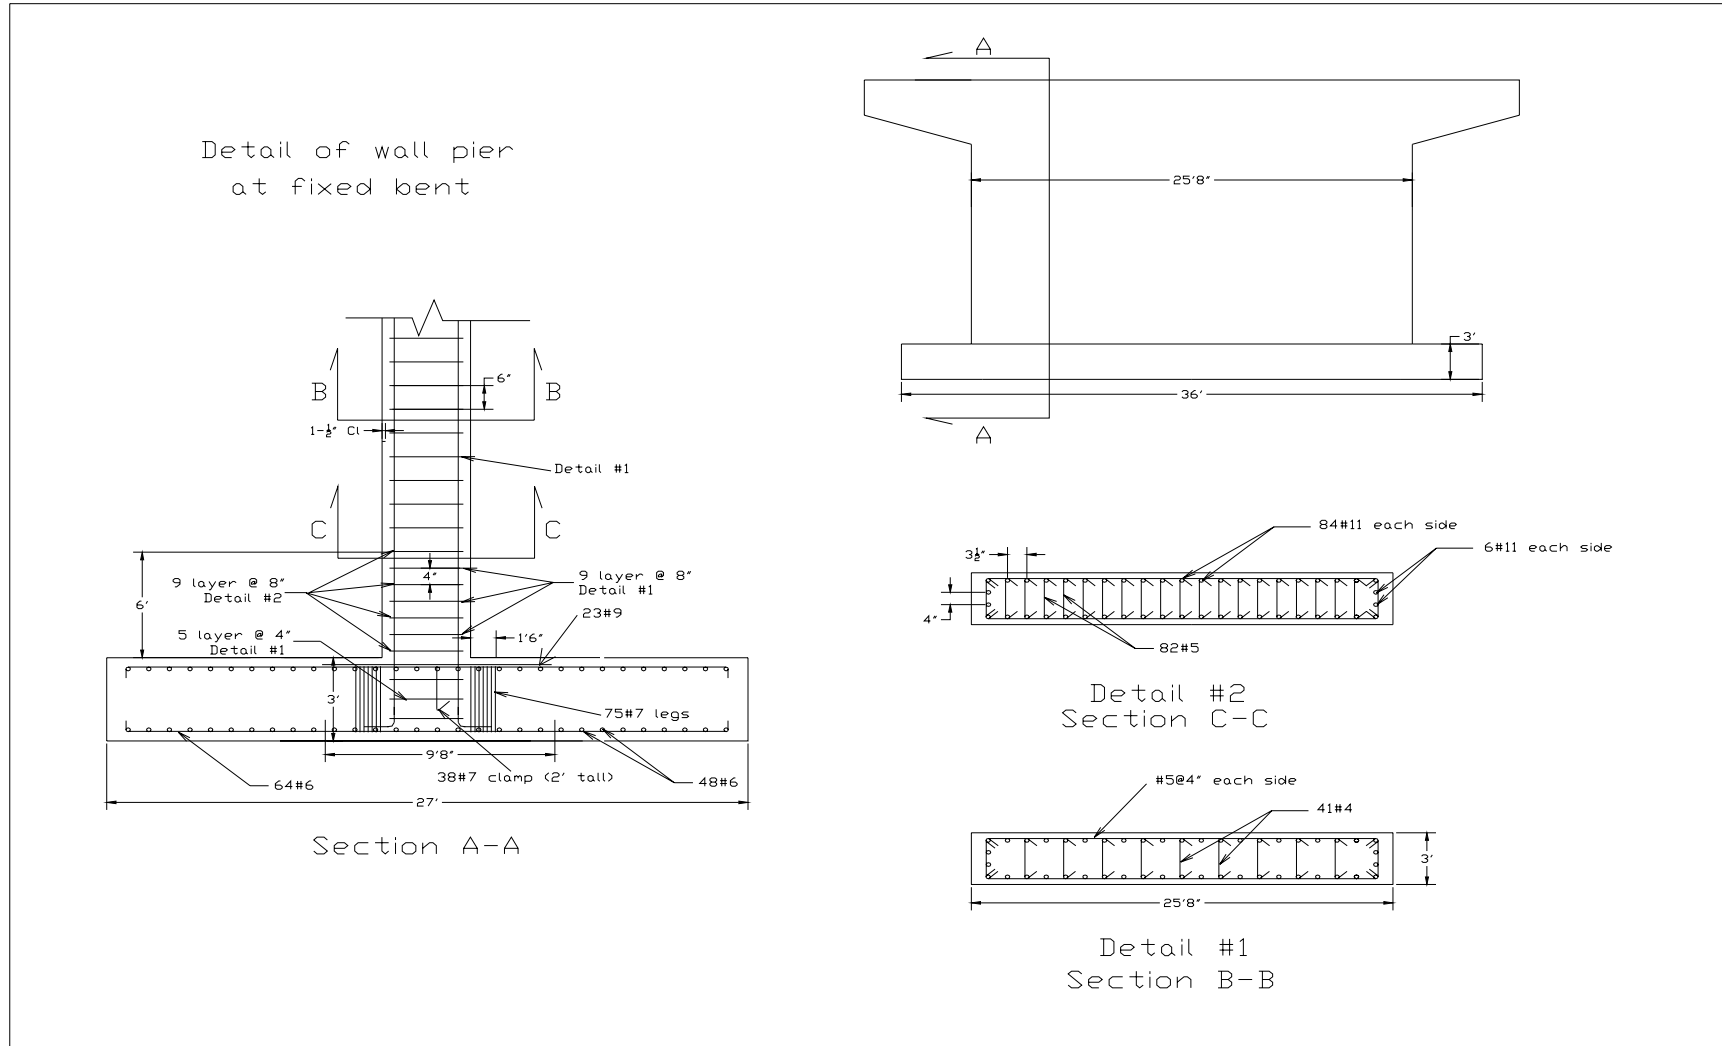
NCHRP Wall Design Details for Fixed Bent
